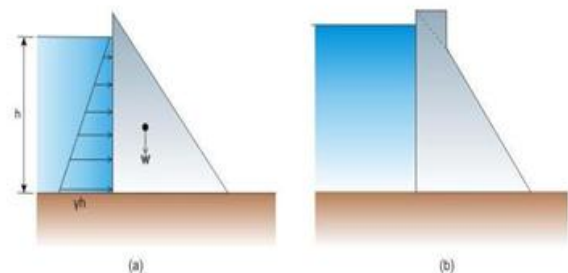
Concrete gravity dam section (a) Basic triangular shape (b) Modified shape
